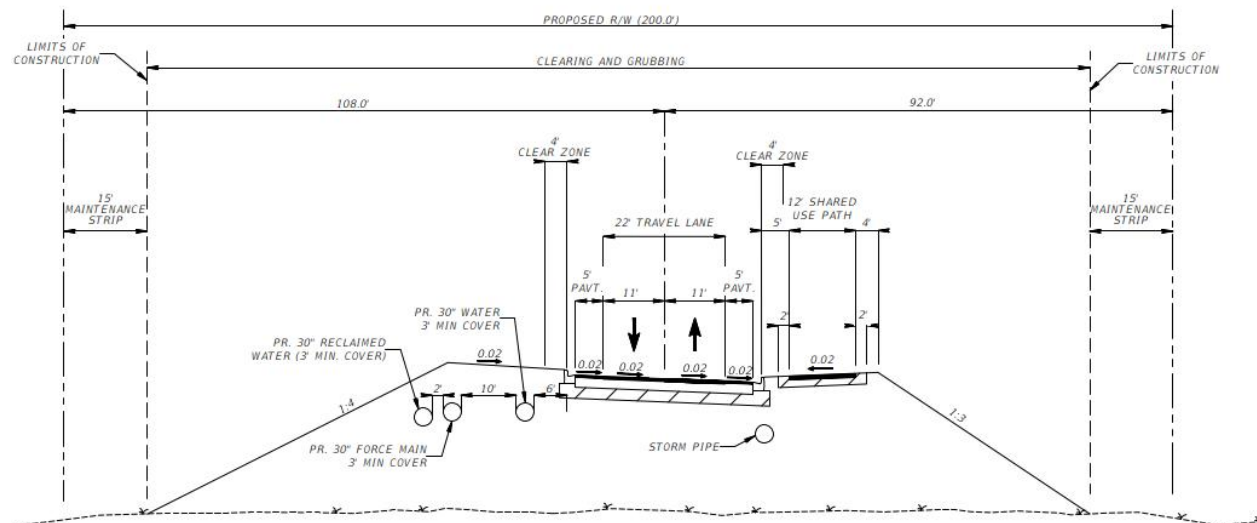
Build Alternative Typical Section from the St. Joe Property Line to Alf Coleman Road
